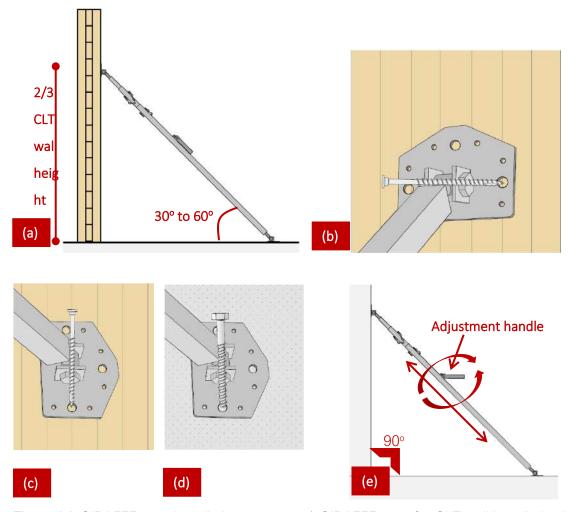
GIRAFFE prop installation process; a) GIRAFFE prop for CLT wall installation in the upper third of the CLT wall at an angle between 30° to 60°; b) GIRAFFE prop connection to CLT wall; c) GIRAFFE prop connection to CLT or concrete floor; d) GIRAFFE prop length adjustment [19].
